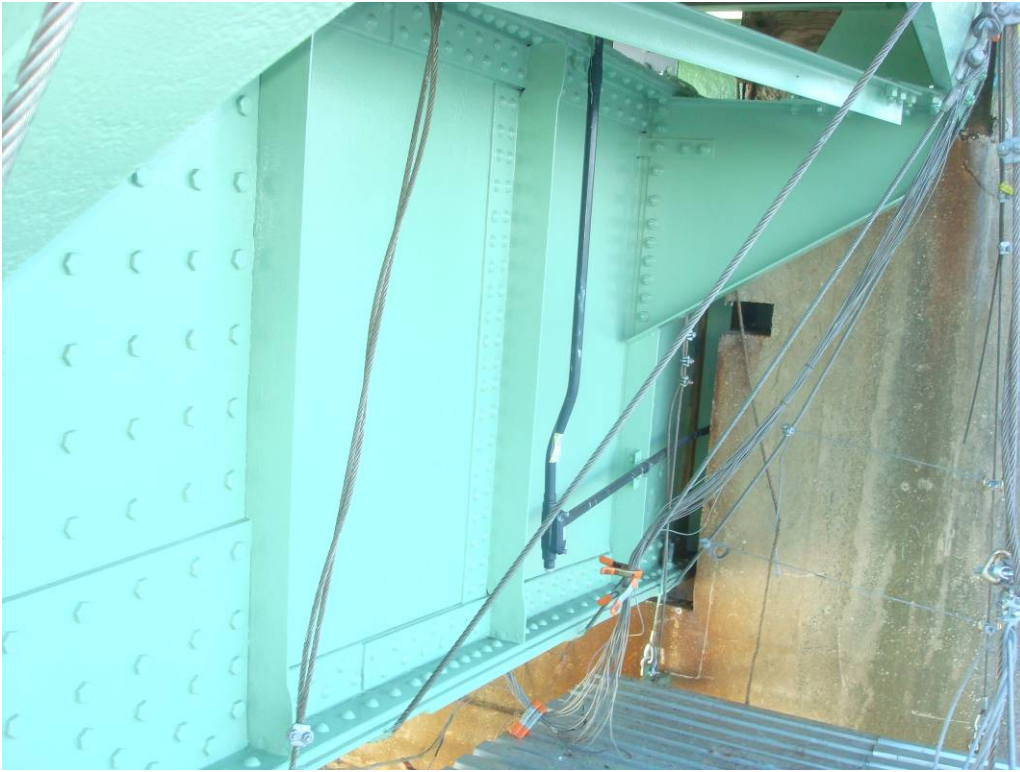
The painters primed the Southeast bascule girder and a portion of the rack at the trunnion area. East face shown.
